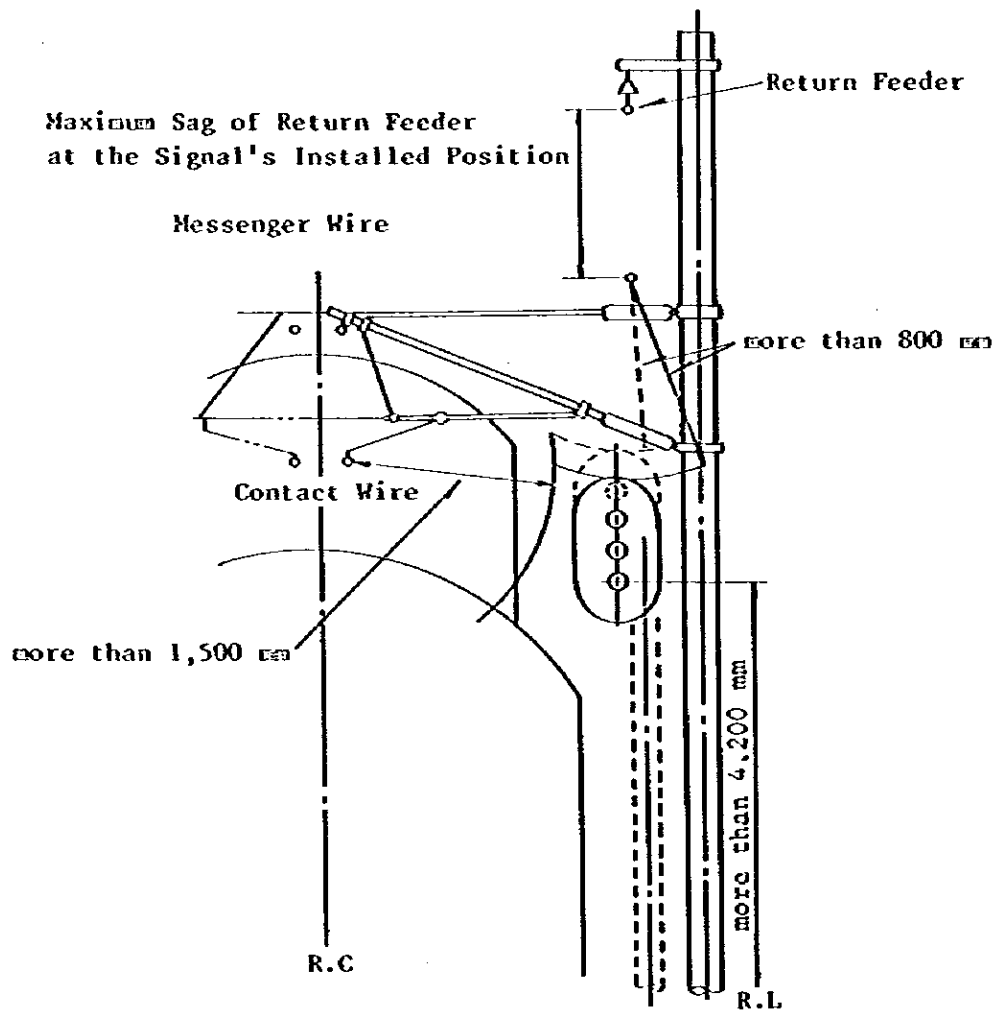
Layout of Signalling Devices in the AC Electrified Section
